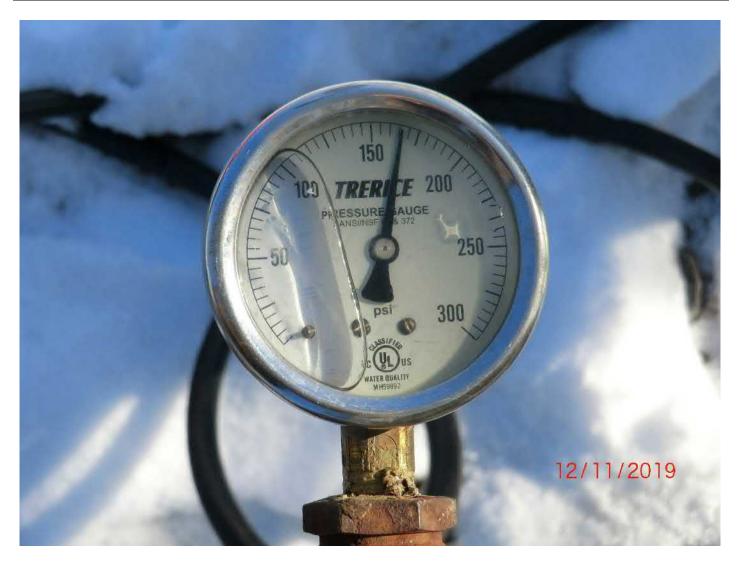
Gauge on hydrant located at intersection of Talcott Ridge and S. Main Street. Reading 167 PSI.
